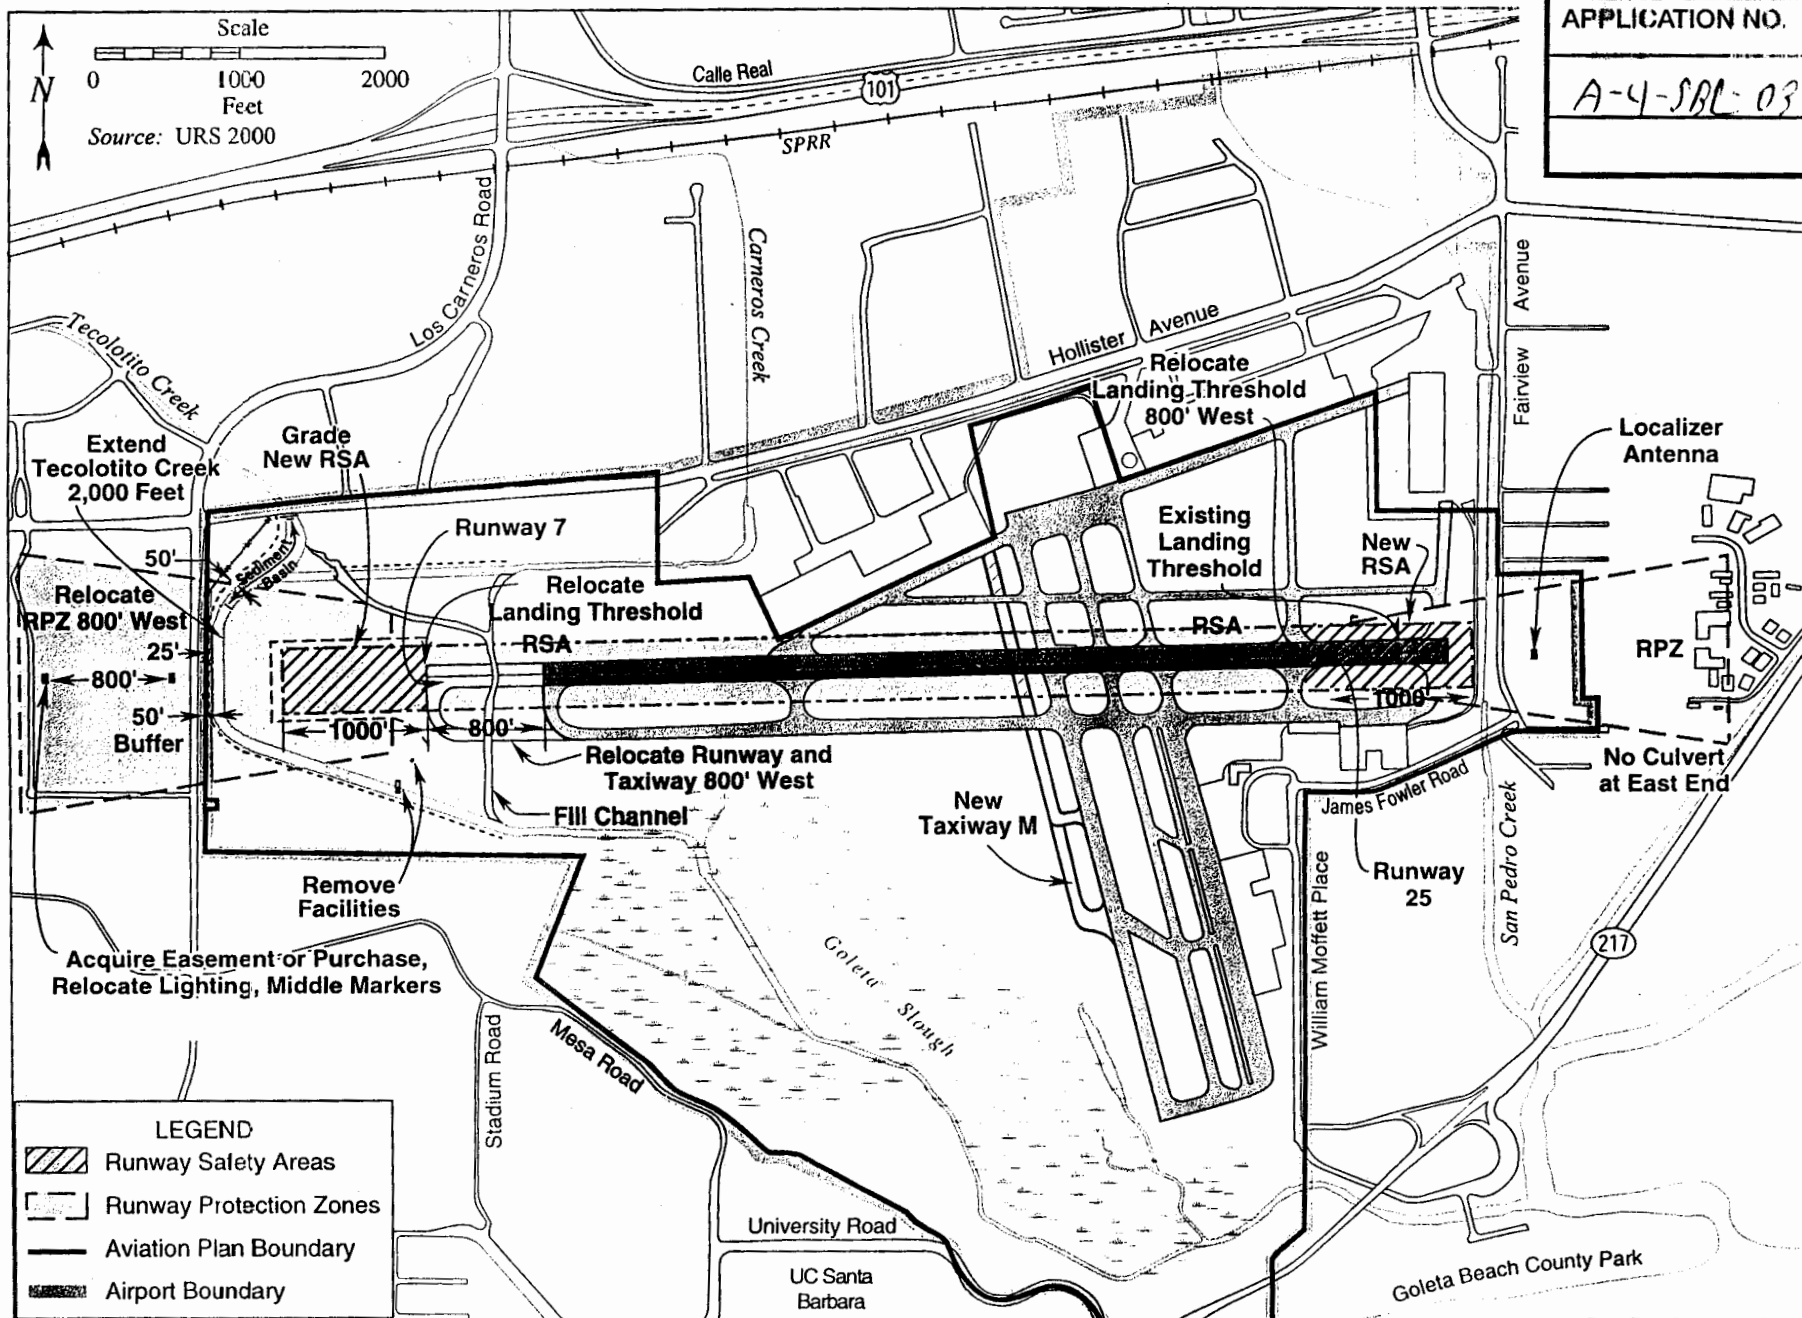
K. Alternative 1, West Creek Realignment Alternative
